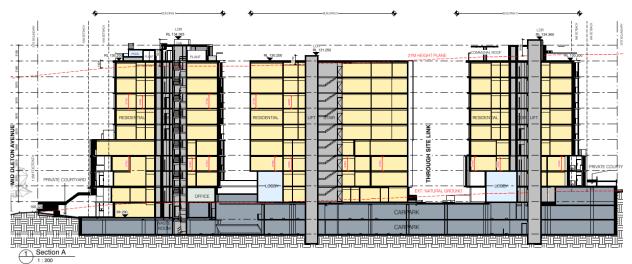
Section A – Proposed Modification (Buildings A, D and C)
